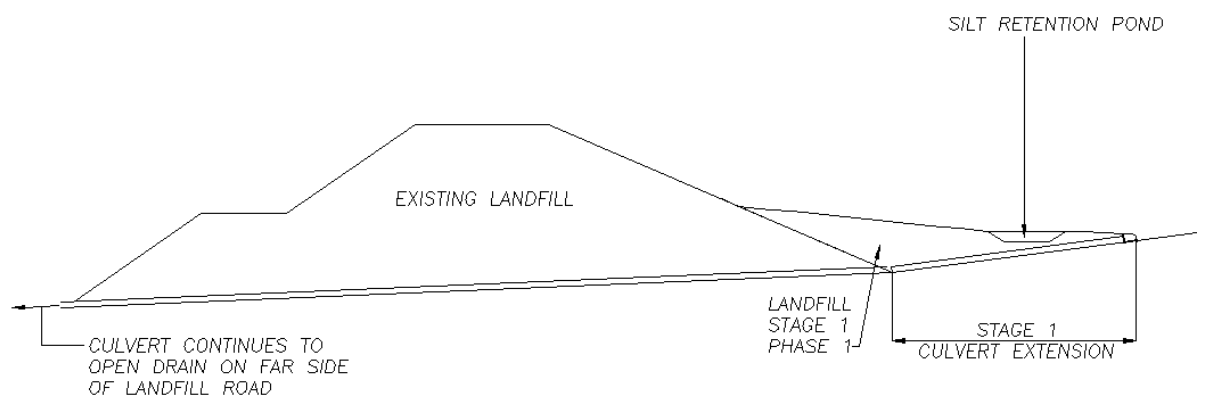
Culvert extension and placement of phase one filling – Landfill extension stage 1
